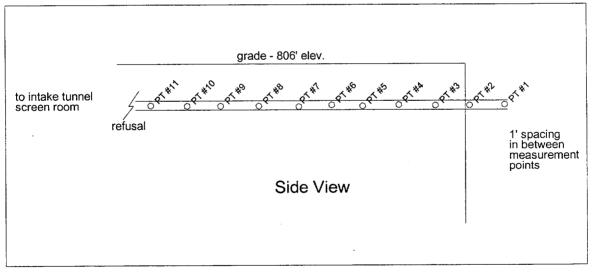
Pipe in SW - SSGS Towards Intake Tunnel Screen Room
